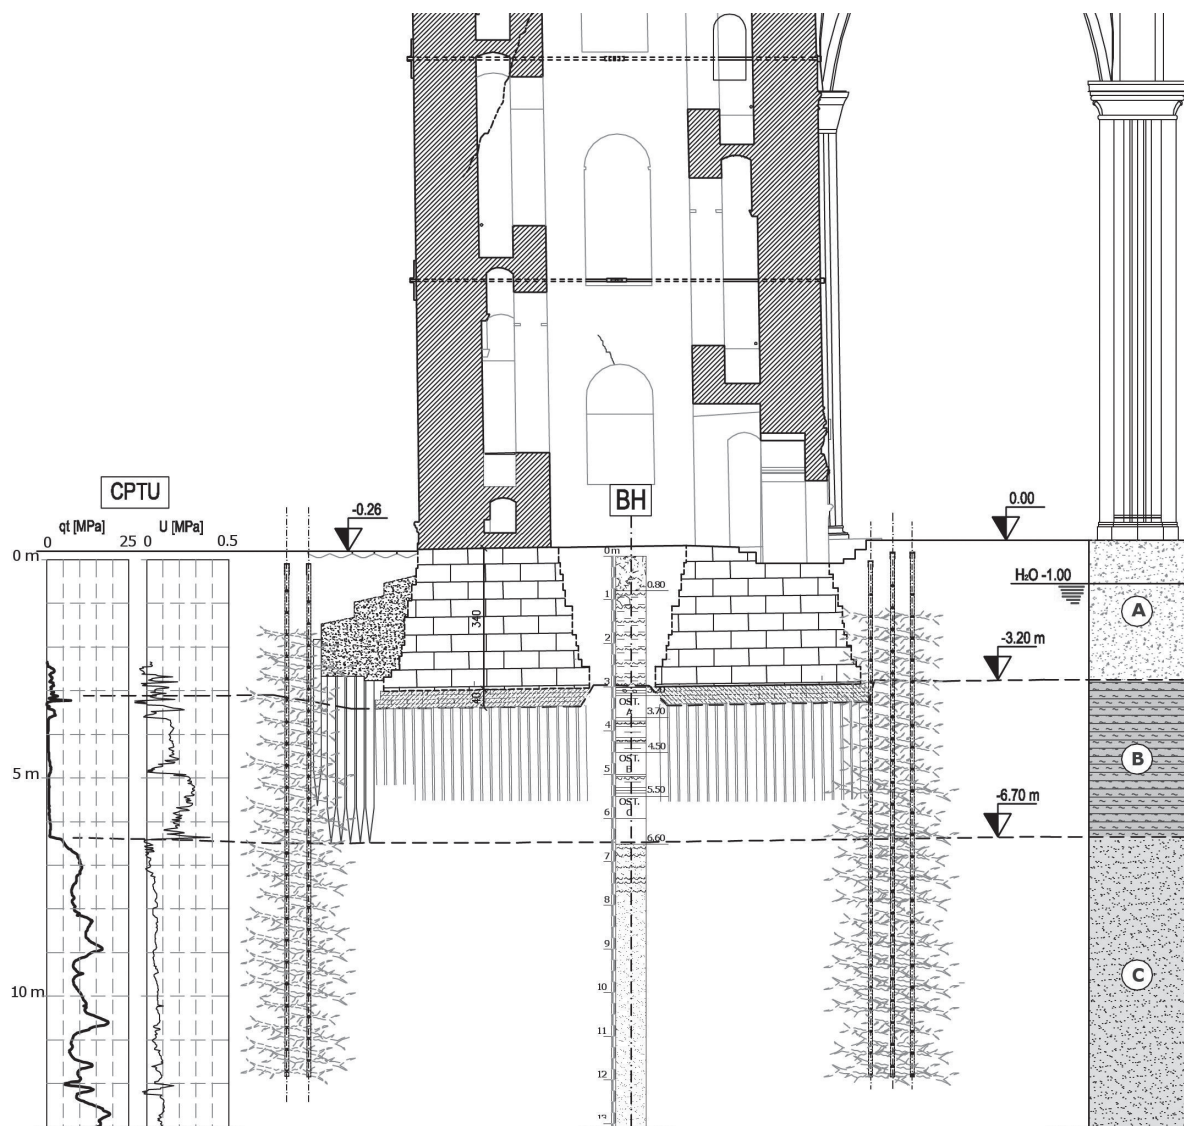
Schematic section of the tower foundation and of the relevant subsoil (SE-NW direction in Fig. 6), with the in-situ test logs, the strengthening intervention of 1904 (left) and the TAMs of the new fracture grouting intervention (Marchi *et al.* 2014).
